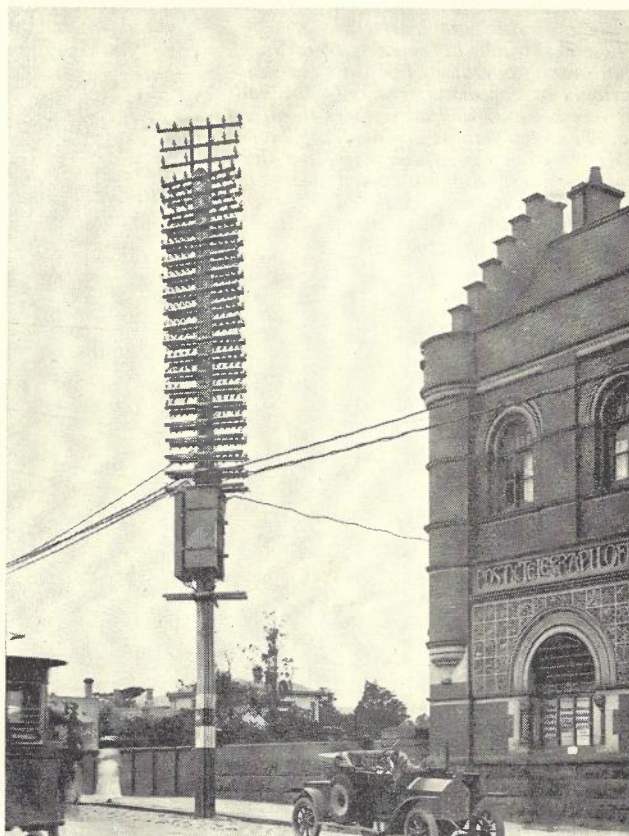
Aerial Construction Outside "Yarra" Exchange. Although this building is no longer used as an exchange, it still plays an important part in the Melbourne telephone story, as it houses the headquarters of the metropolitan traffic engineering division which is currently dealing with crossbar development in the Melbourne area.
